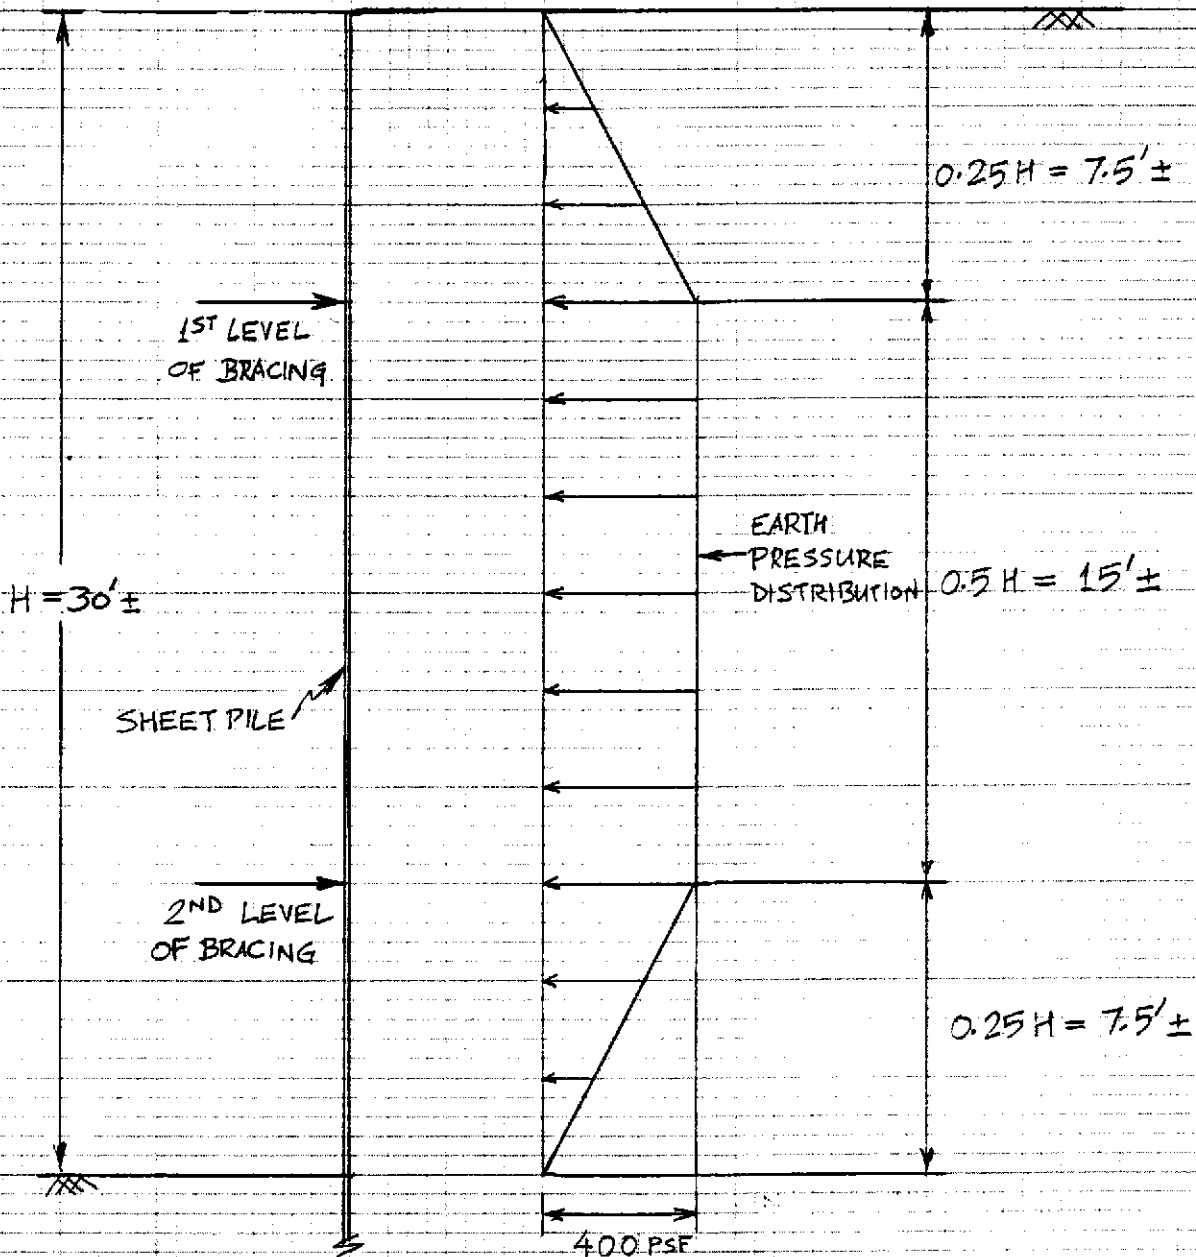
EARTH PRESSURES ON TEMPORARY BRACED WALLS
